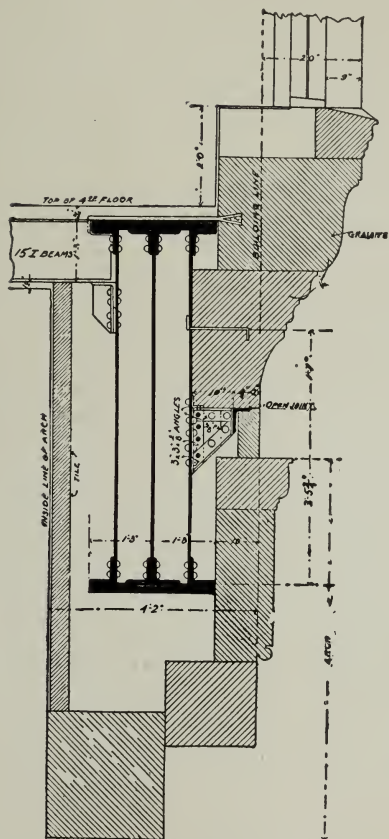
Spandrel Wall Supports. Masonic Temple, Chicago.
